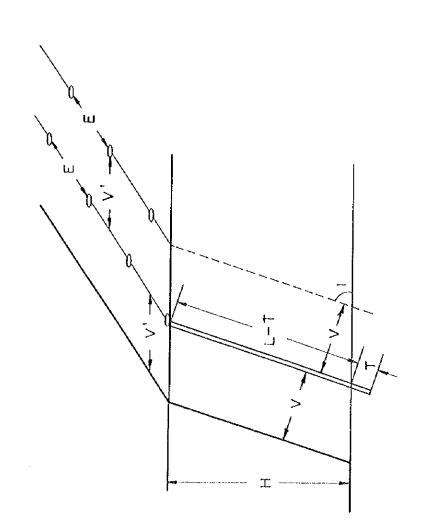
DESIGN OF THE OPEN-CUT DRILLING
